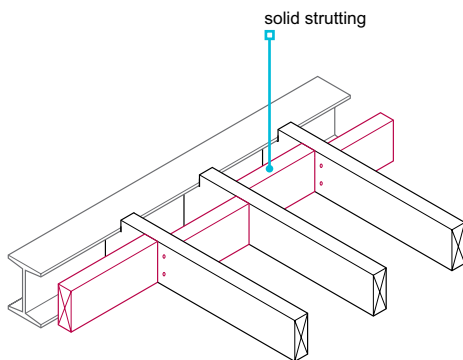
I-joist supported on timber blocking fixed to web of steel beam
